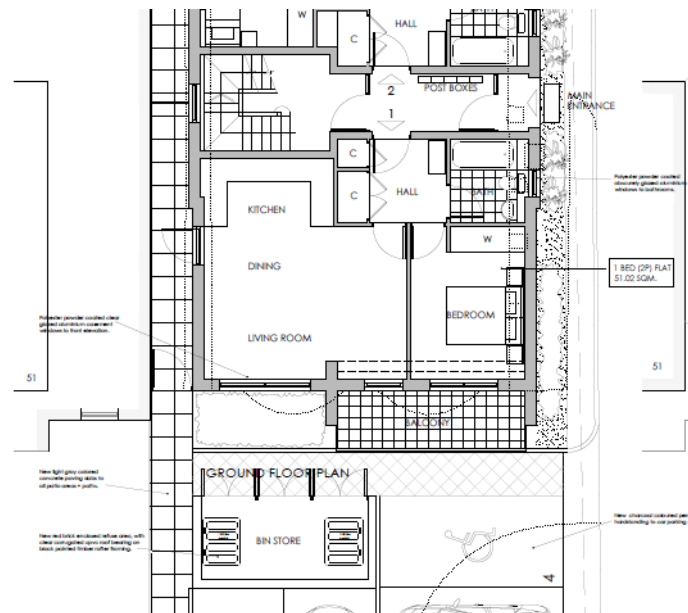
Previous planning application (20/01556/FUL) ground floor layout
